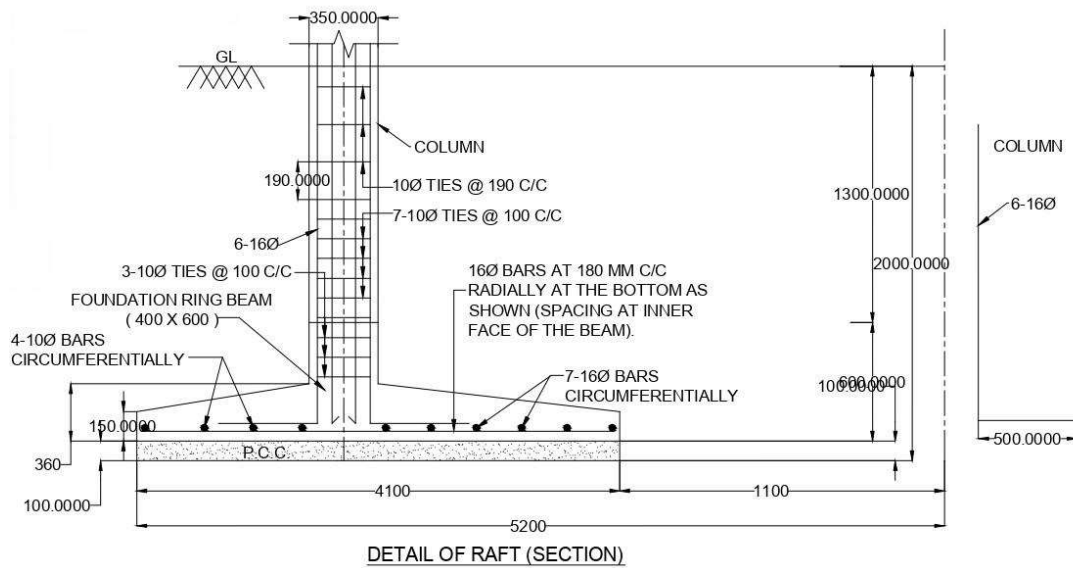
Sectional reinforcement plan of raft foundation of hybrid circular tank
